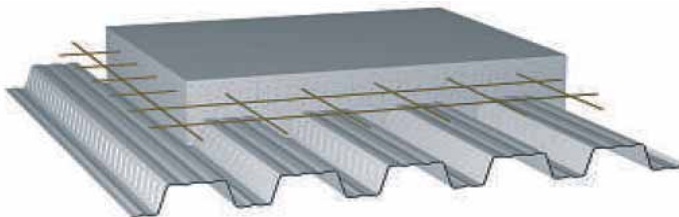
Cofraplus floor (Floor systems guide, ARVAL, 2013)
